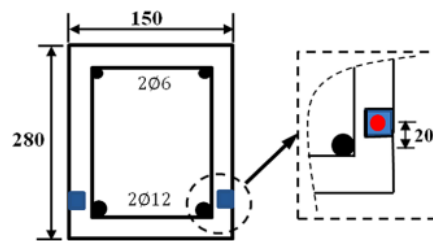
Beam cross section after strengthening with CFRP rod 20mm above the level of steel bar
